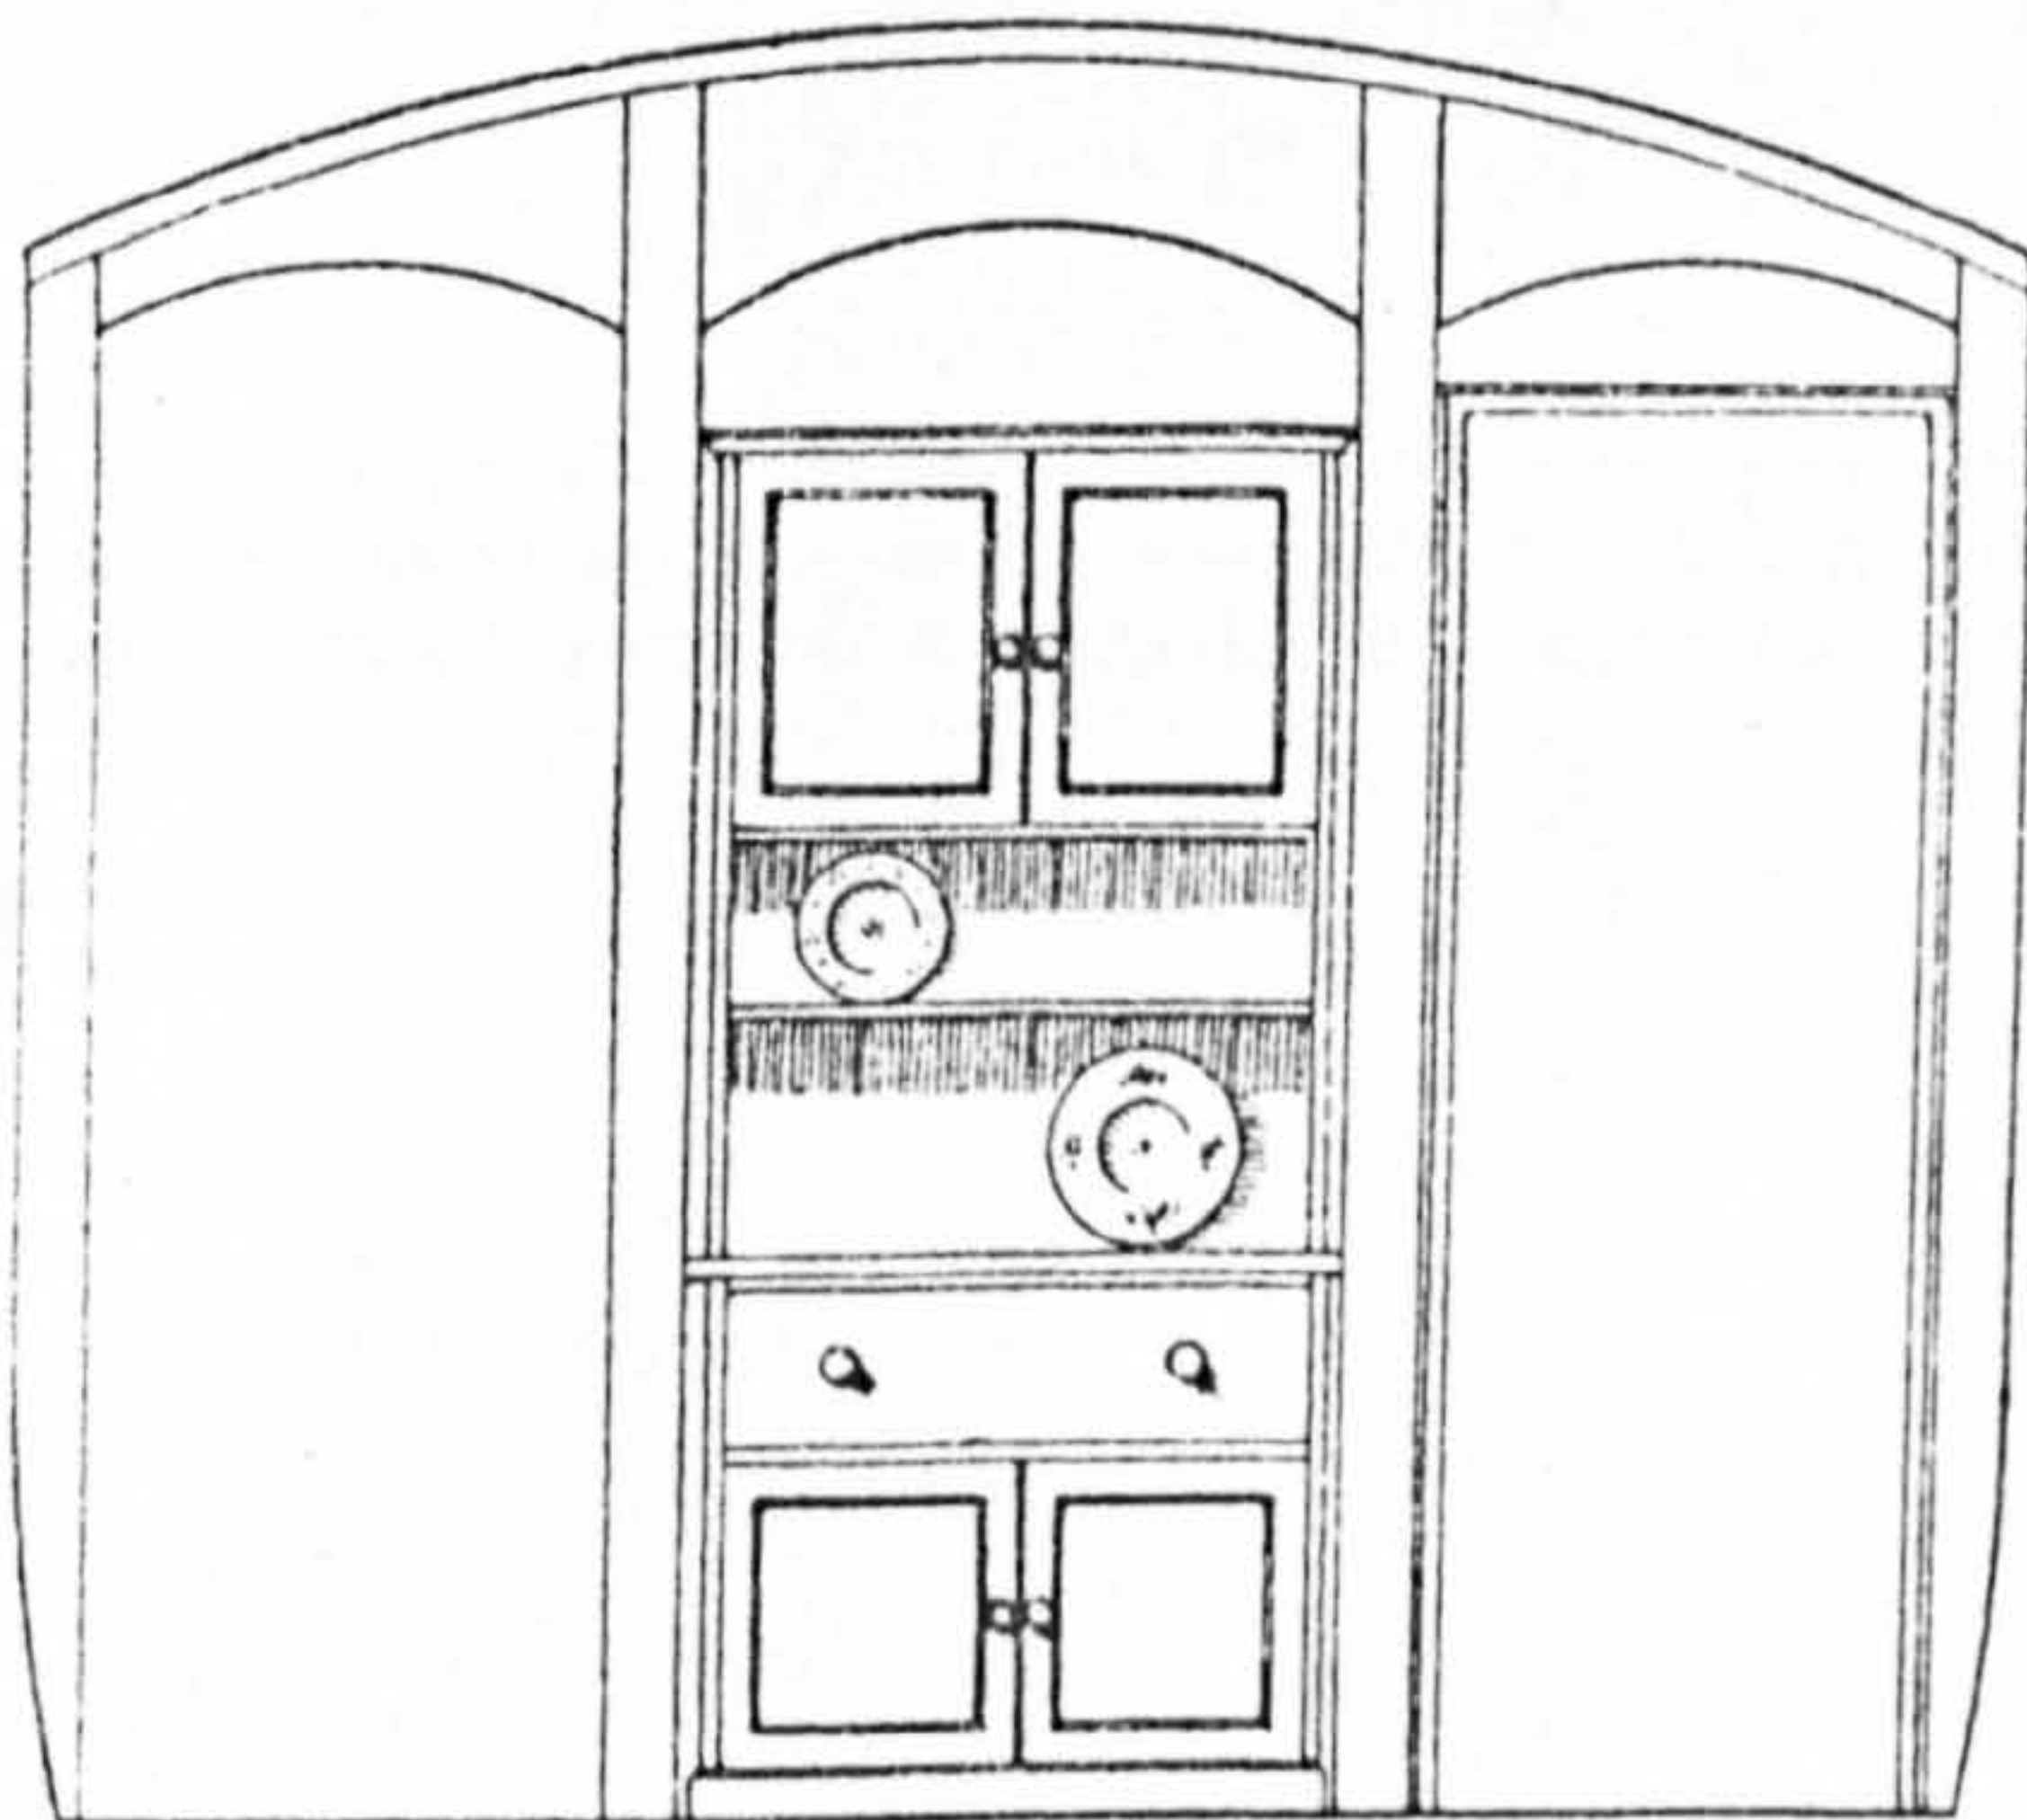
ELEVATION C, SHOWING DRESSER; ALSO CORRIDOR OPENING (RIGHT) AND WALL CHAIR SPACE (LEFT).
